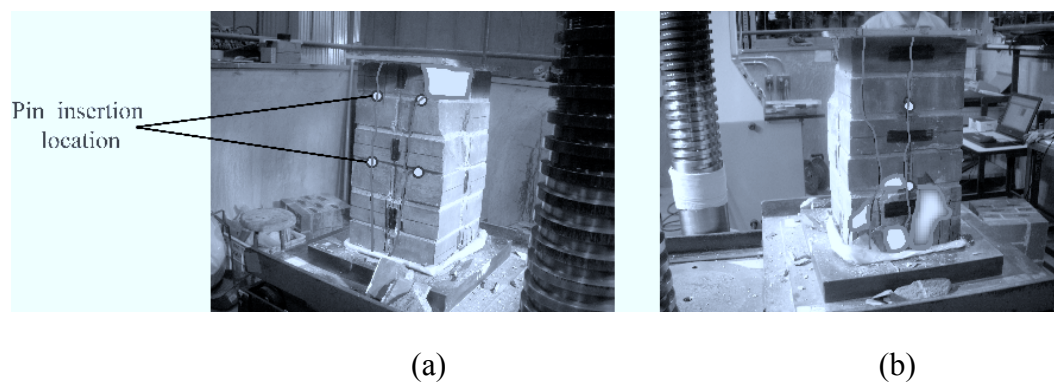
Final failure mechanism for RM specimen: (a) Front view, (b) Back view.
